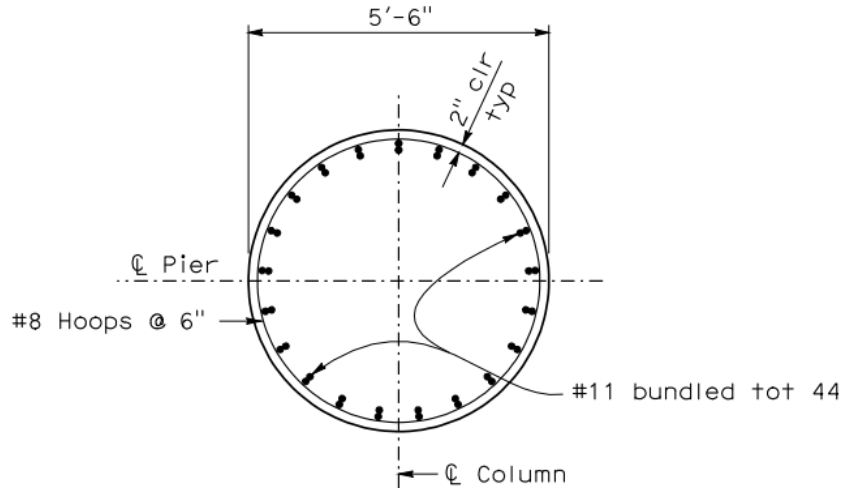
Cross-section detail of OSB2 bridge column (Caltrans)
